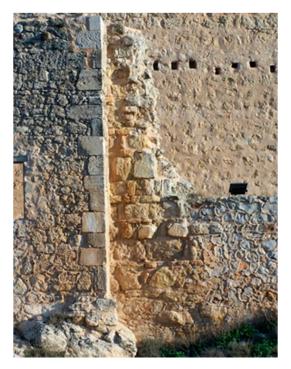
Wall with faceted masonry in Uclés (photo: authors).
